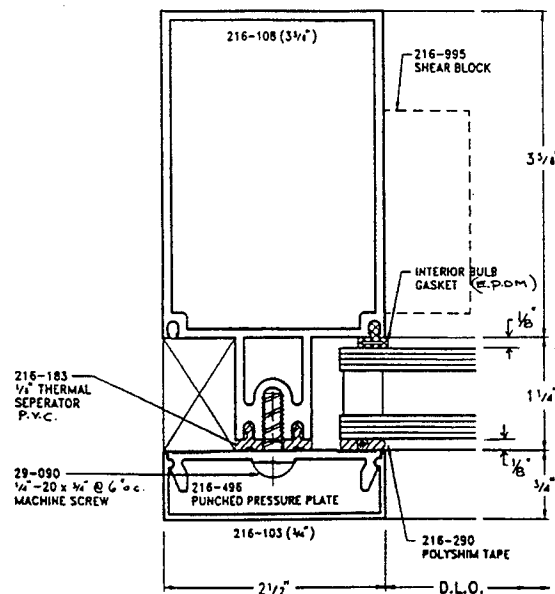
Spandrel Sill / Vision Head Cross-Section
